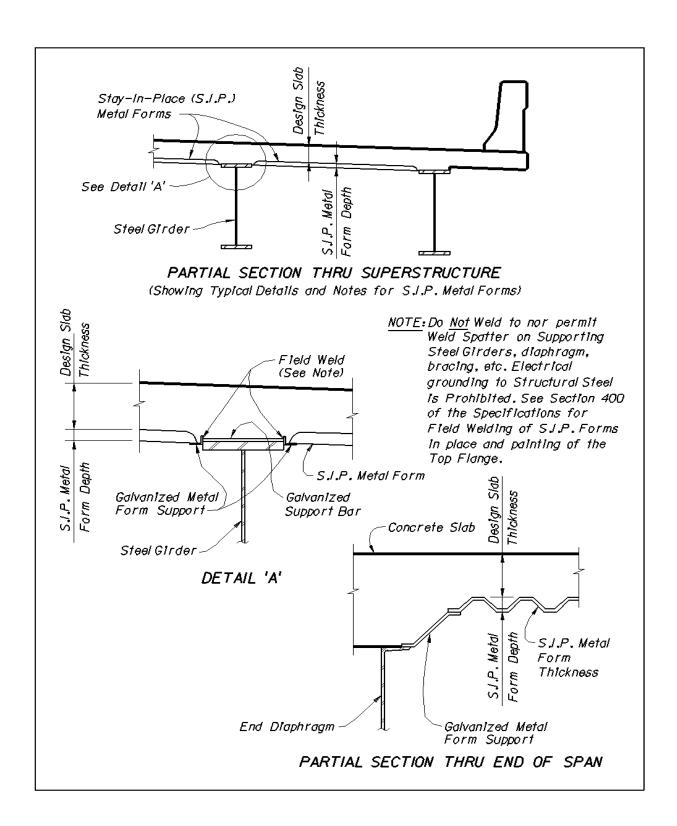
Stay-in-Place Metal Forms for Steel Girders
